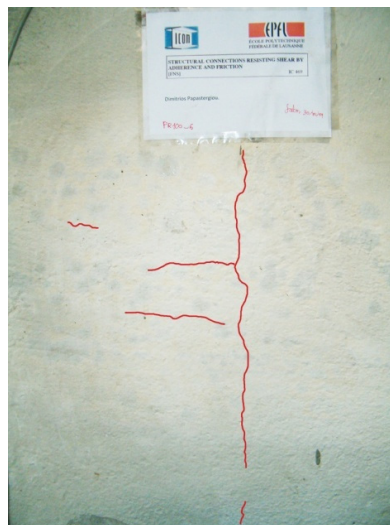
Pre-cracking of concrete block of specimen PR100\_6.
